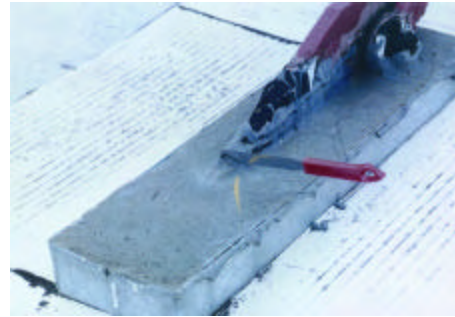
The putty knife is in an opening in the pitch pocket sealer. Photo R-1 shows where the pitch pockets occur.
